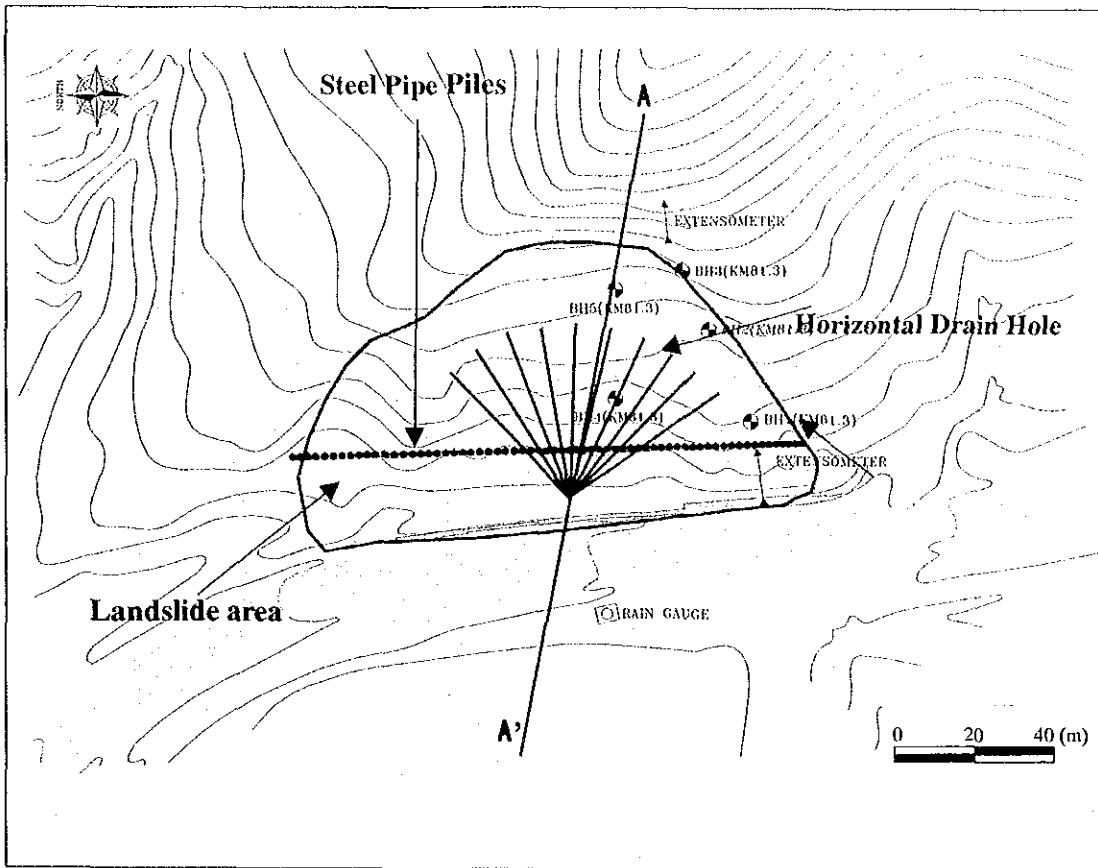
Plan of Steel-pipe pile works at CH 81.30 km.
